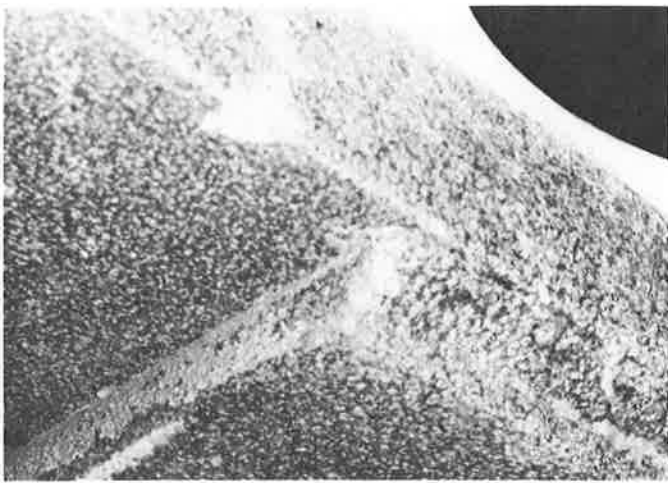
Corrosion Pitting of Beam Flange and Welded Coverplate
